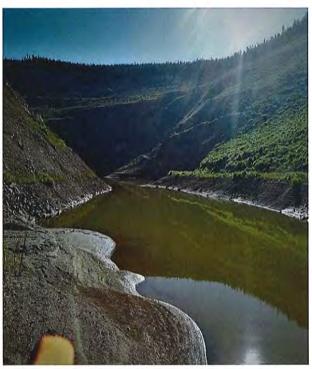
North Pit- West Wall: photo taken from North-Pit South Wall looking North.
